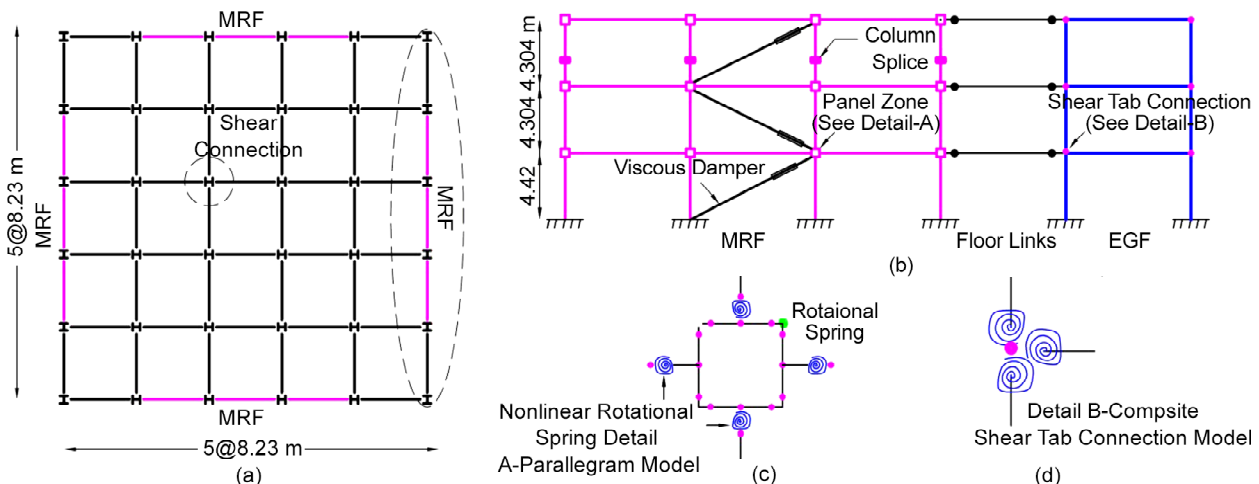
(a) Plan view, (b) typical elevation, and (c) panel zone modeling (d) shear tab connection for the considered structures.
